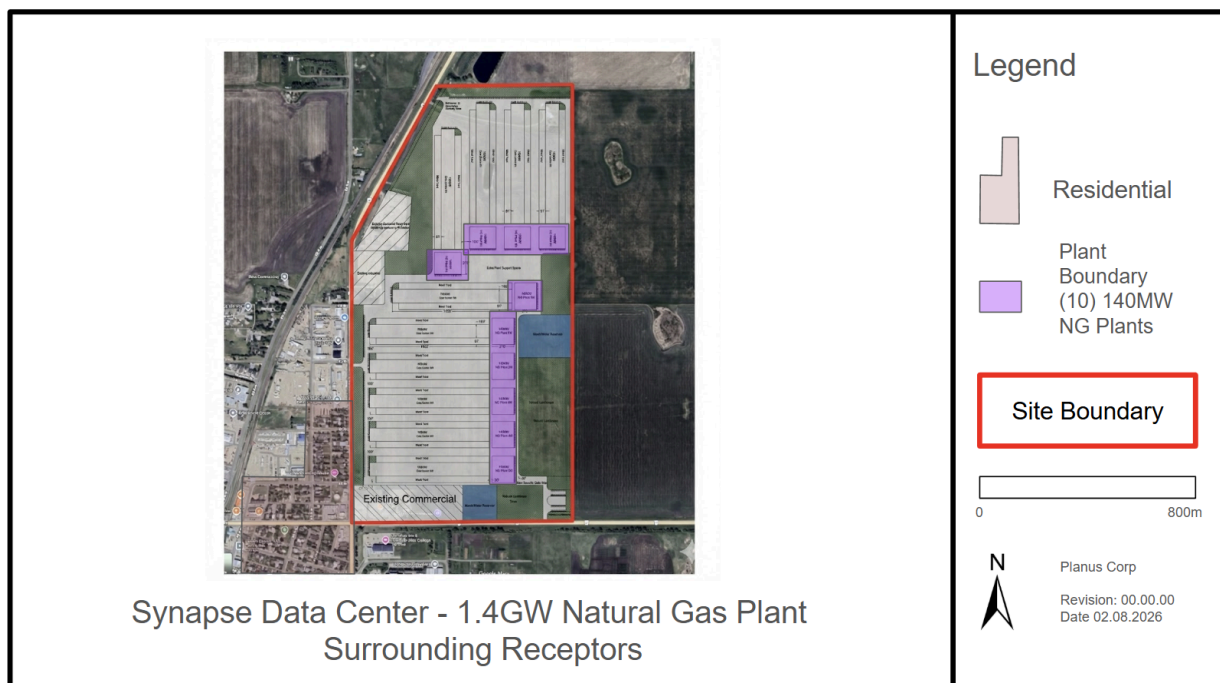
Satellite Overlay of Facility Site Plan
